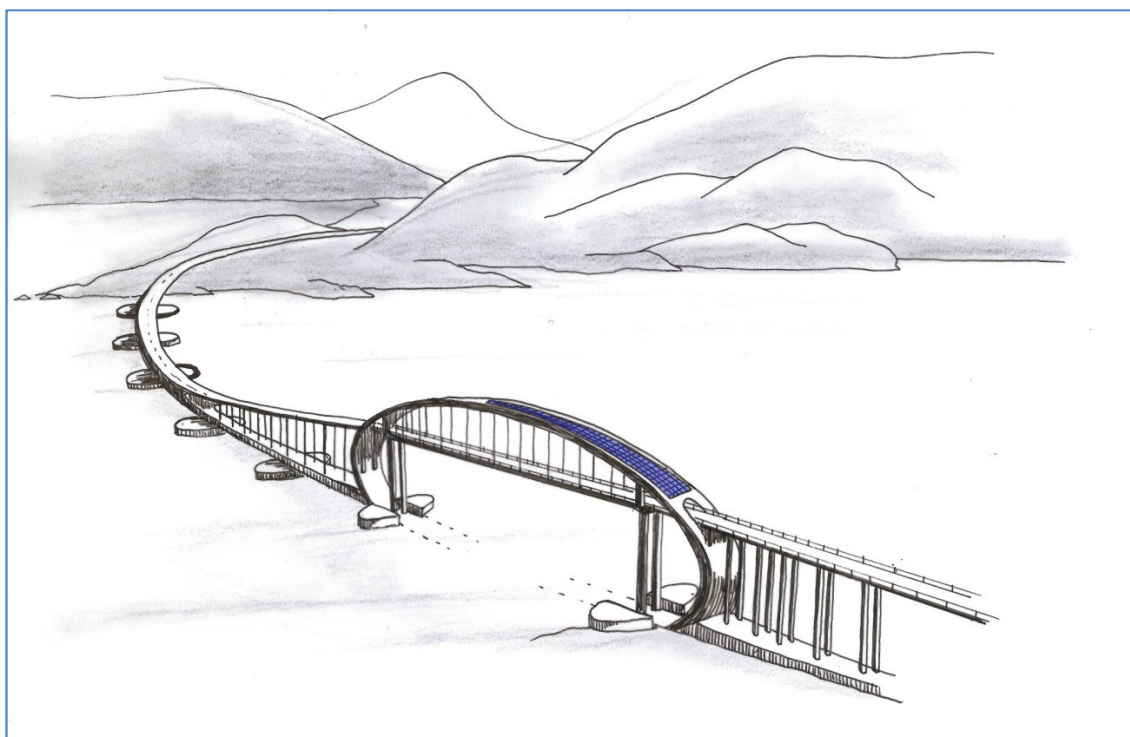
Illustration drawing of floating bridge with arced shipping lane and roof-mounted panels
